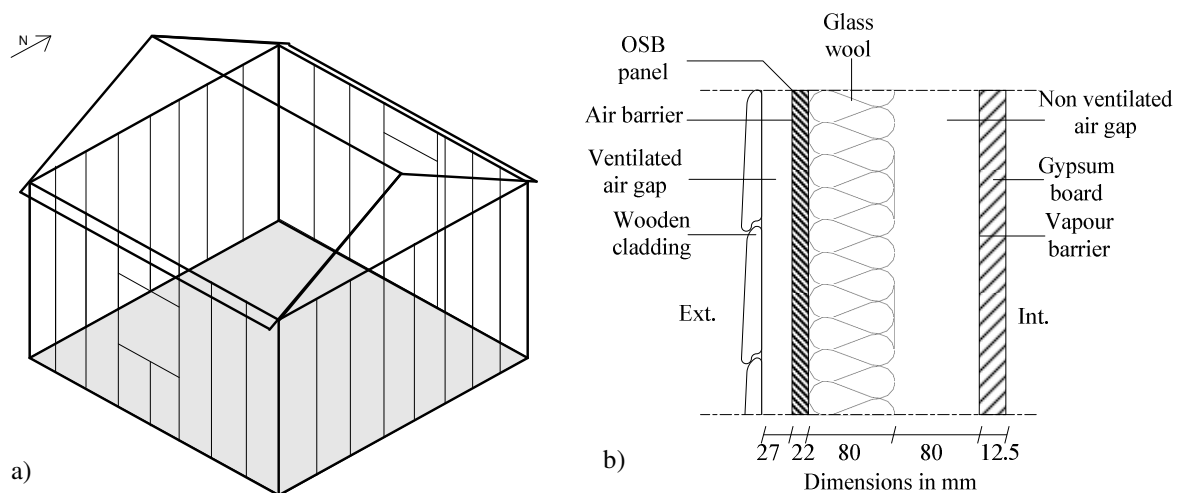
Schematic drawing of the test cell (frame and wall section)
